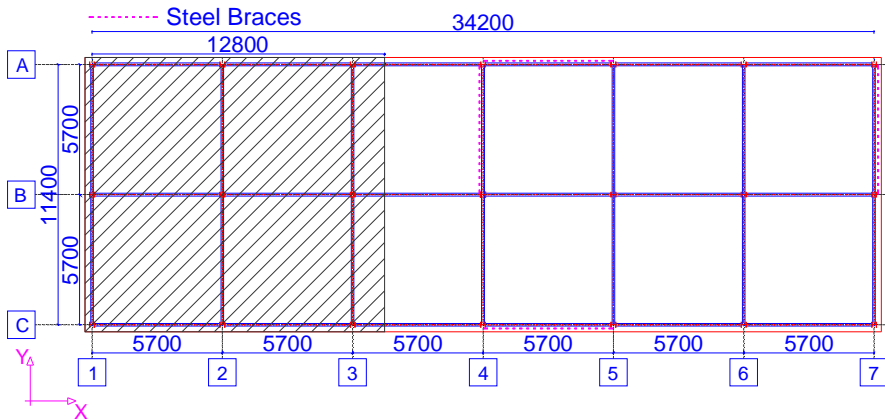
Floor Framing Plan - Symmetric Configuration (dimensions in mm)
